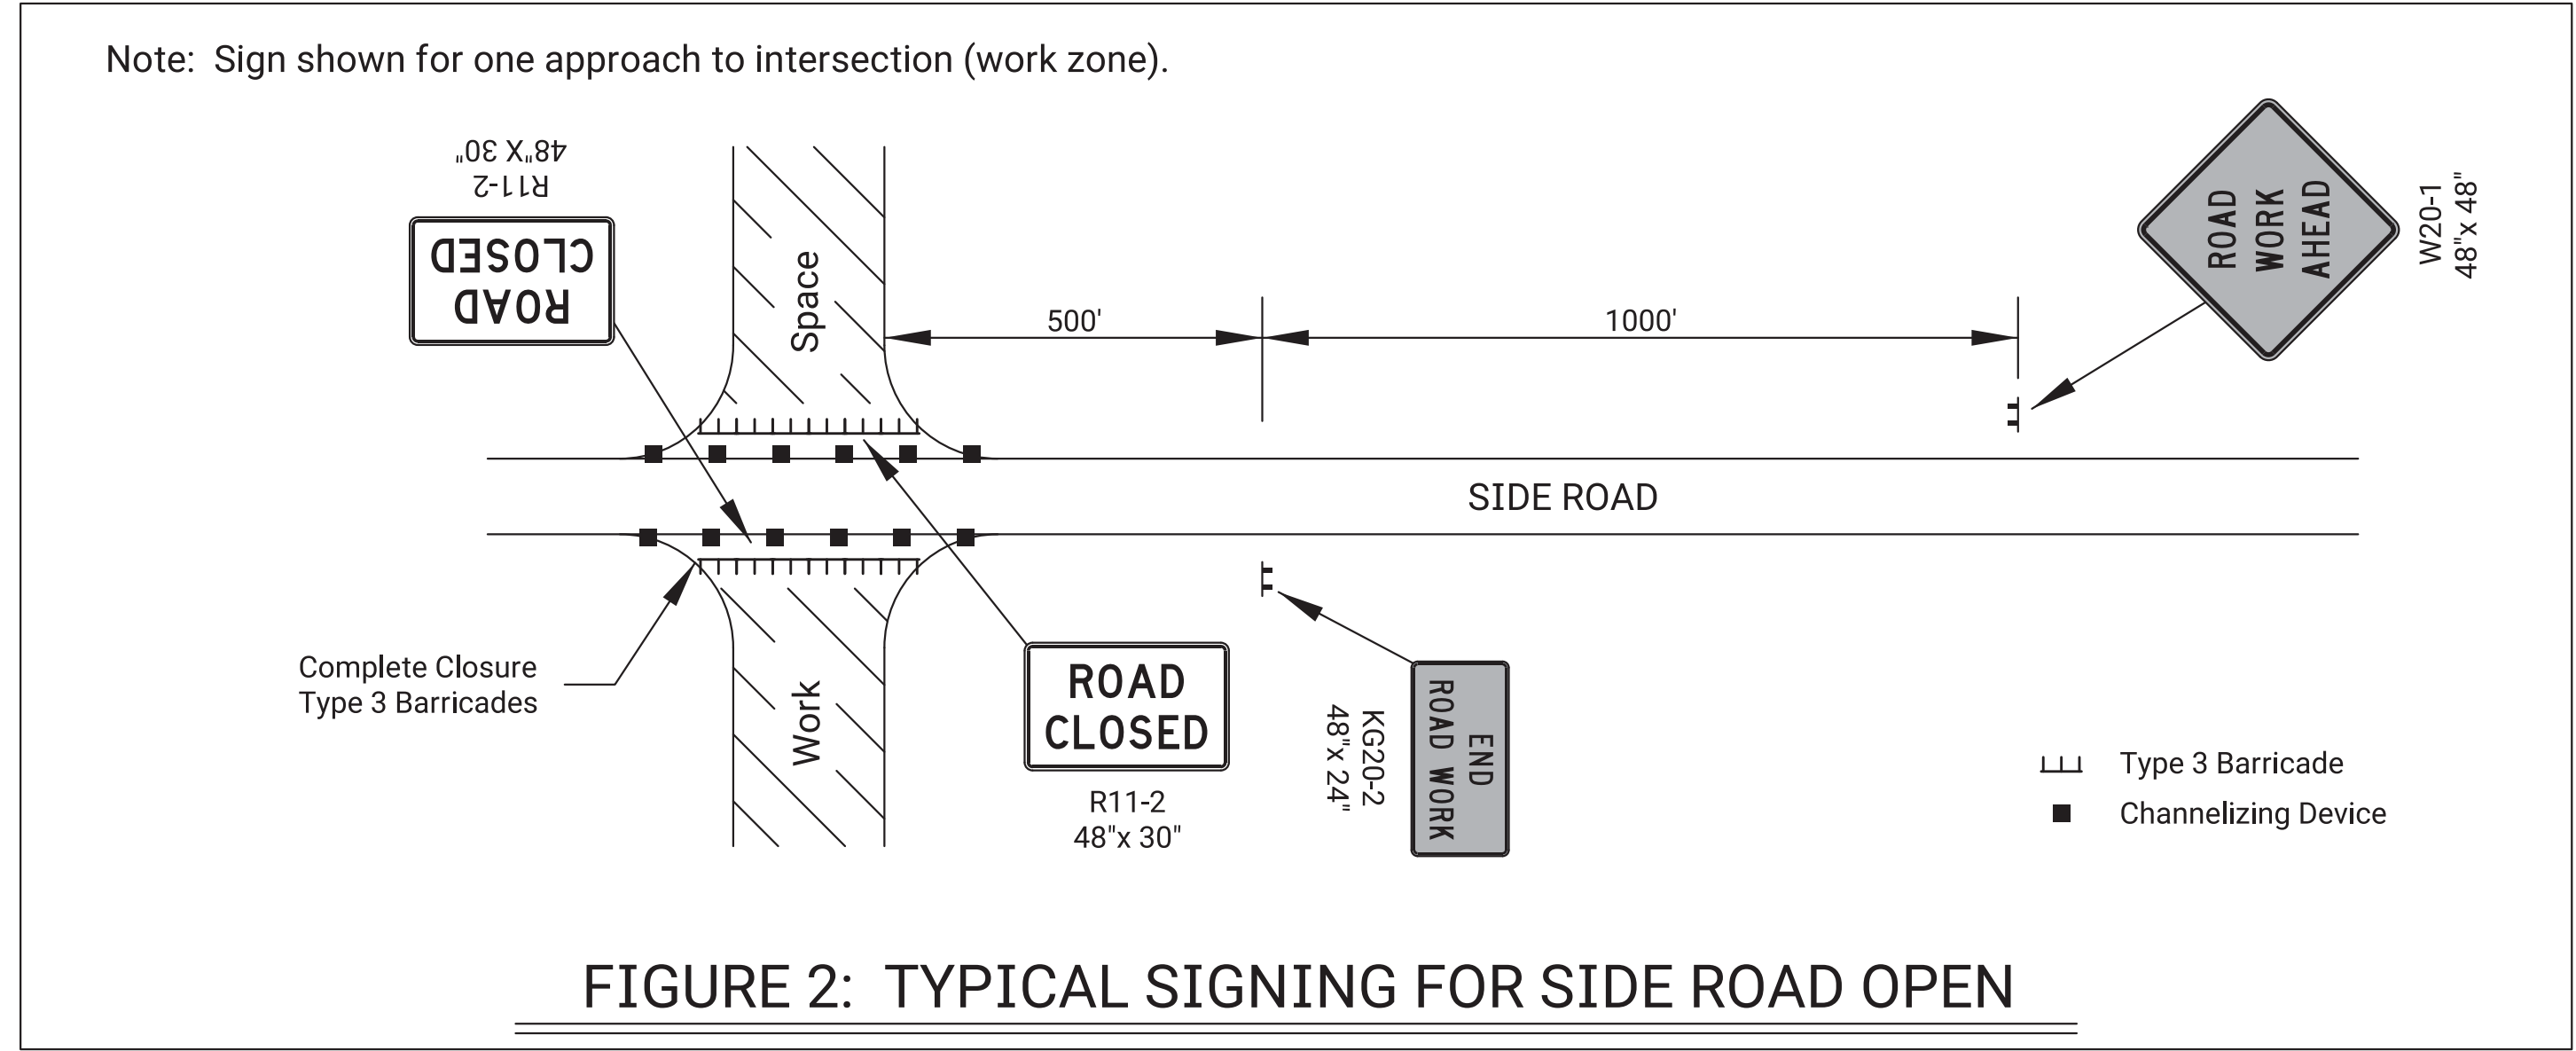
TYPICAL SIGNING FOR SIDE ROAD OPEN
